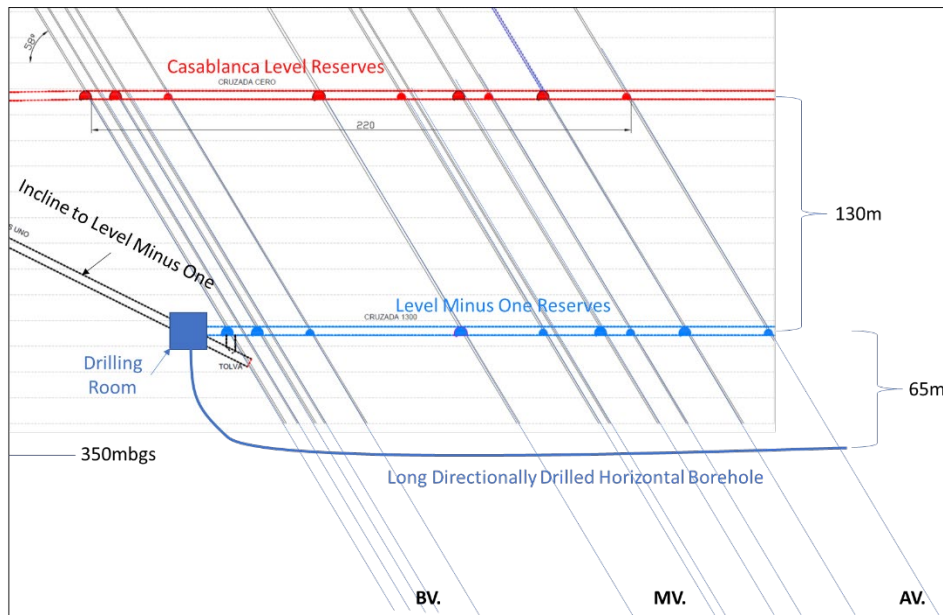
Elevation View (Looking NE) Showing Horizontal Borehole Placement Below Level -1.
